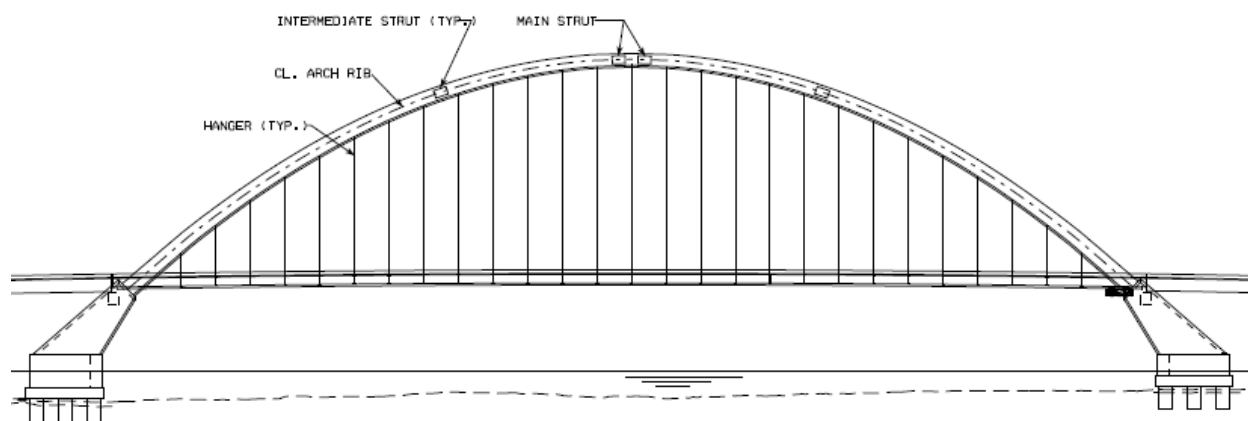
Elevation View of an Arch Truss with Main Components Labeled
